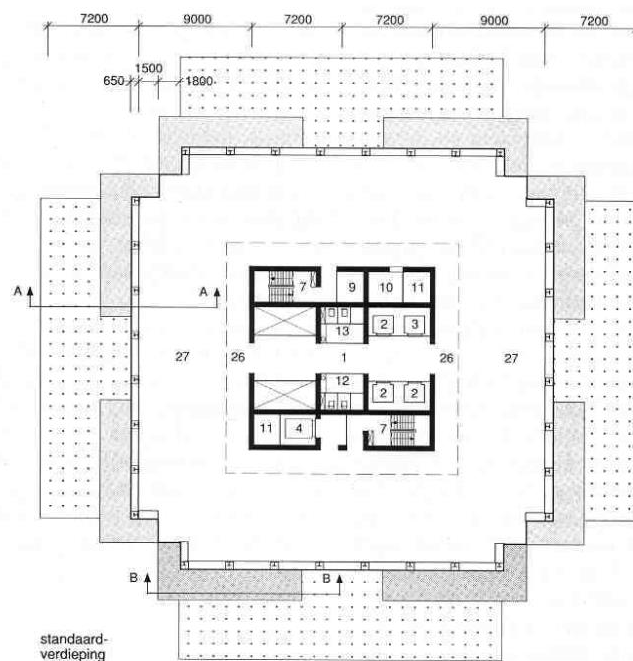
Floor plan of Rembrandt tower. Source: Abspoel [1].
